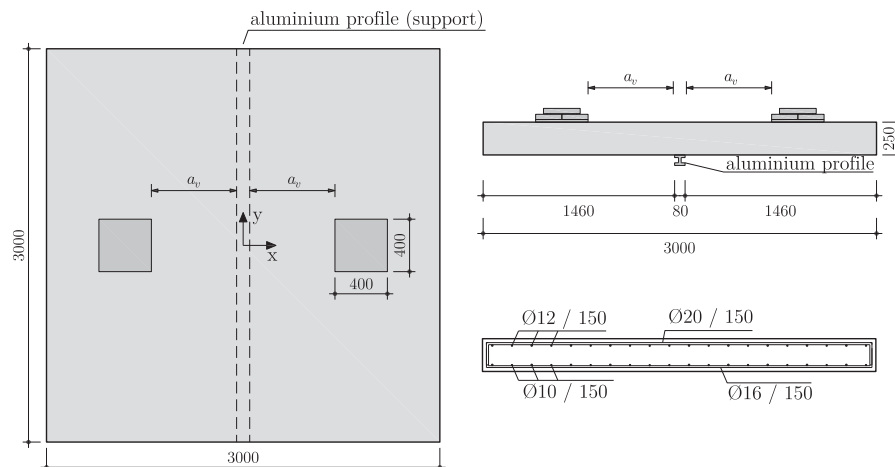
Geometry and reinforcement layout of tested slabs (dimensions in [mm]).
